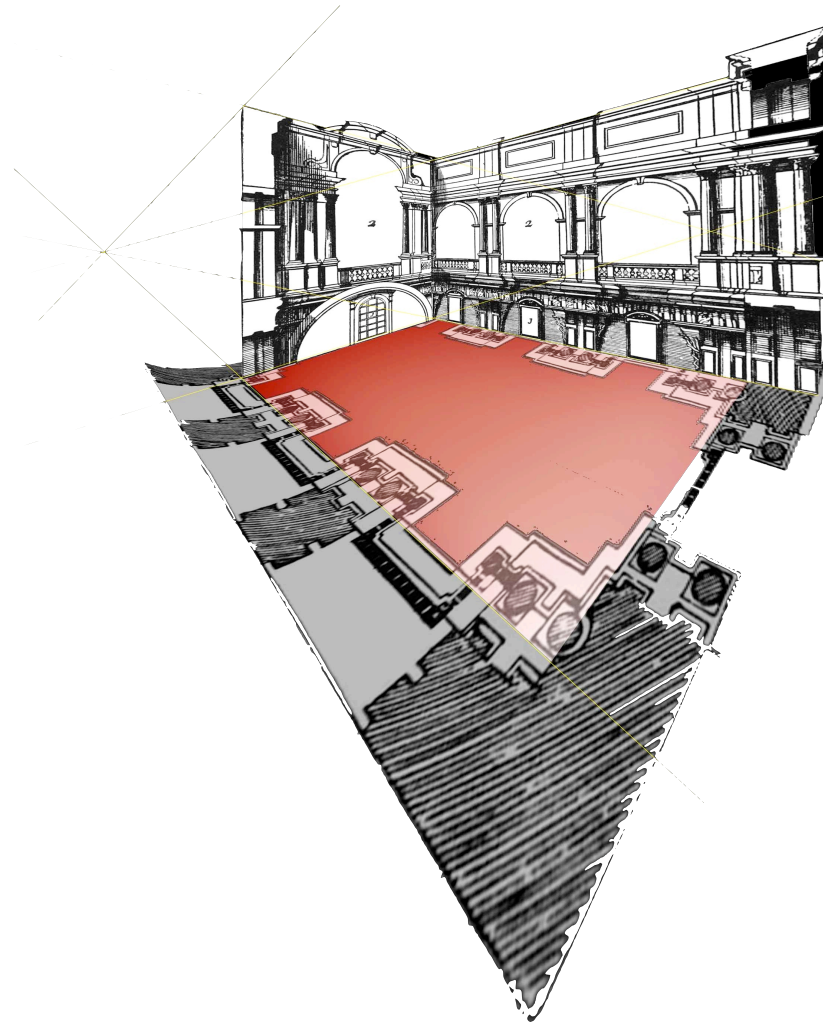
Distortion of the hypothetical elevations and floorplan of the painting, as if it were built.
